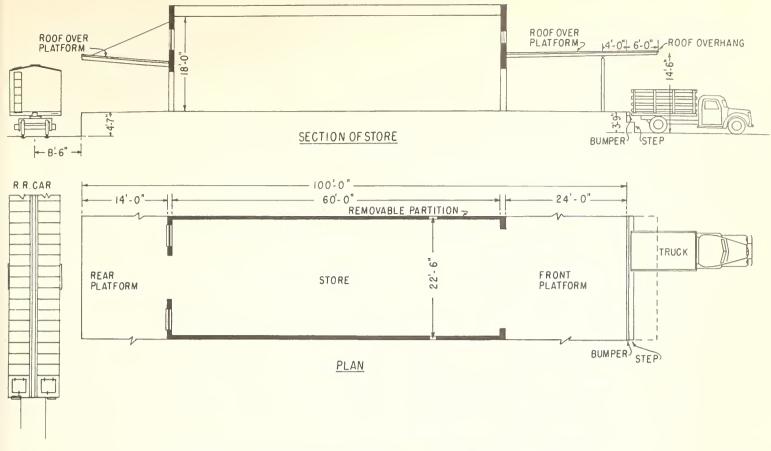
Typical plan and elevation of a store unit in a multistore building.
